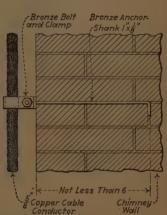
Anchor clamp for securing cable to chimney wall.
